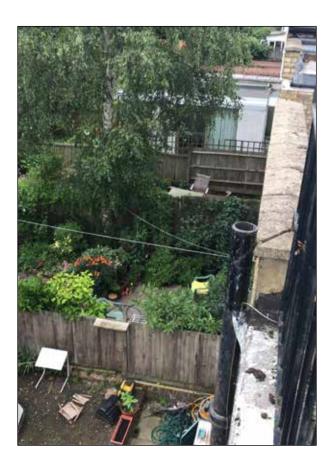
Existing view of No.17's long extension from upper floor flat 2019.
